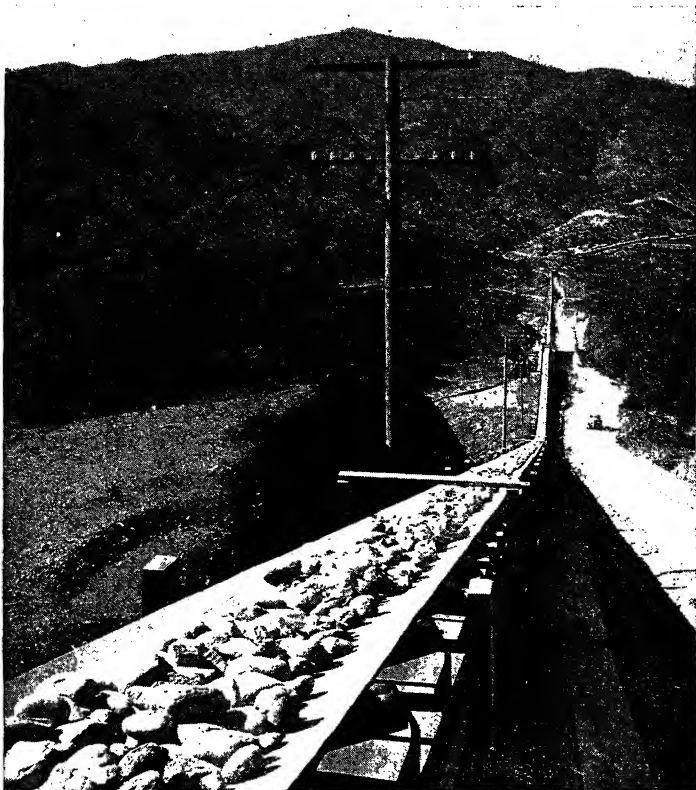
Belt conveyor at Shasta Dam. (Courtesy of U.S. Department of Interior.)
